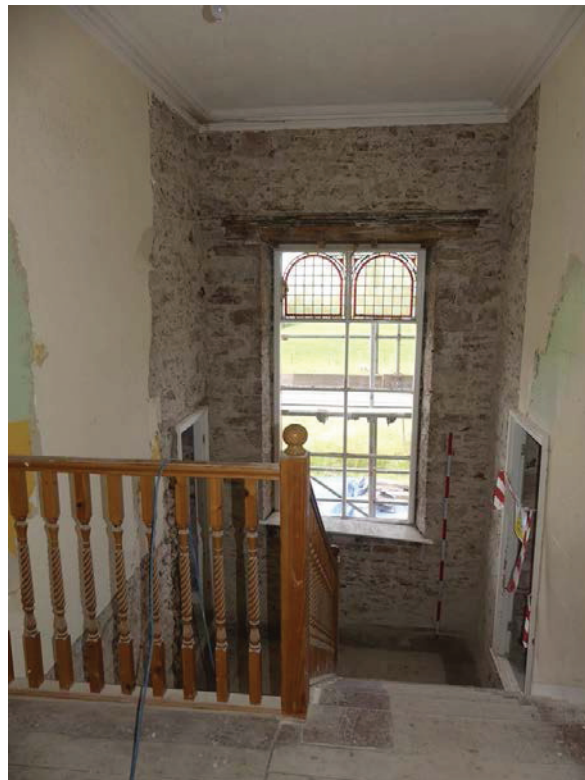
The south-west elevation, Room F3, viewed from the north-east
